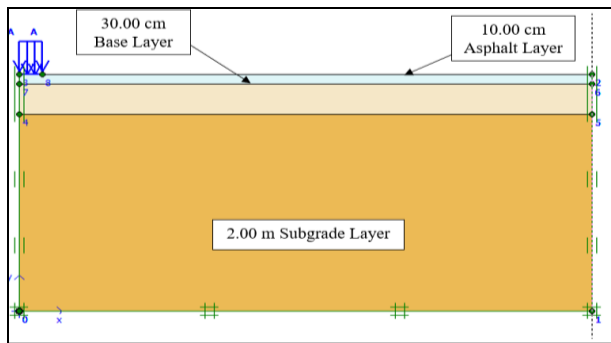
PROPOSED PAVEMENT STRUCTURE MODEL
